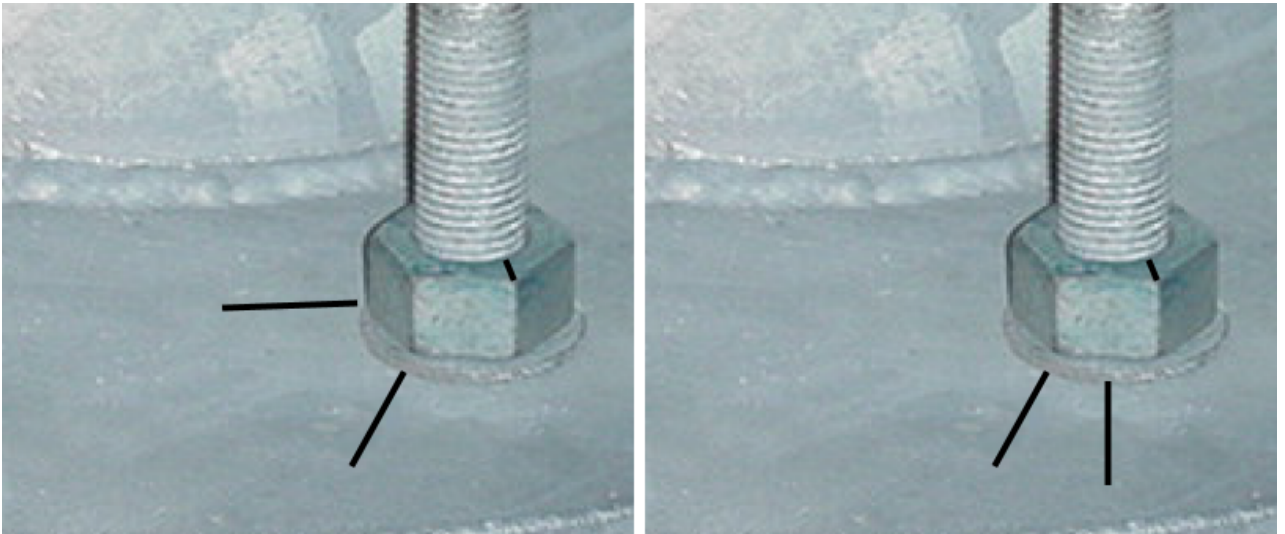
SNUG TIGHT CONDITION REFERENCE MARKS FOR BOLTS 1-1/2” DIAMETER OR LESS (LEFT) AND BOLTS GREATER THAN 1-1/2” DIAMETER (RIGHT)
